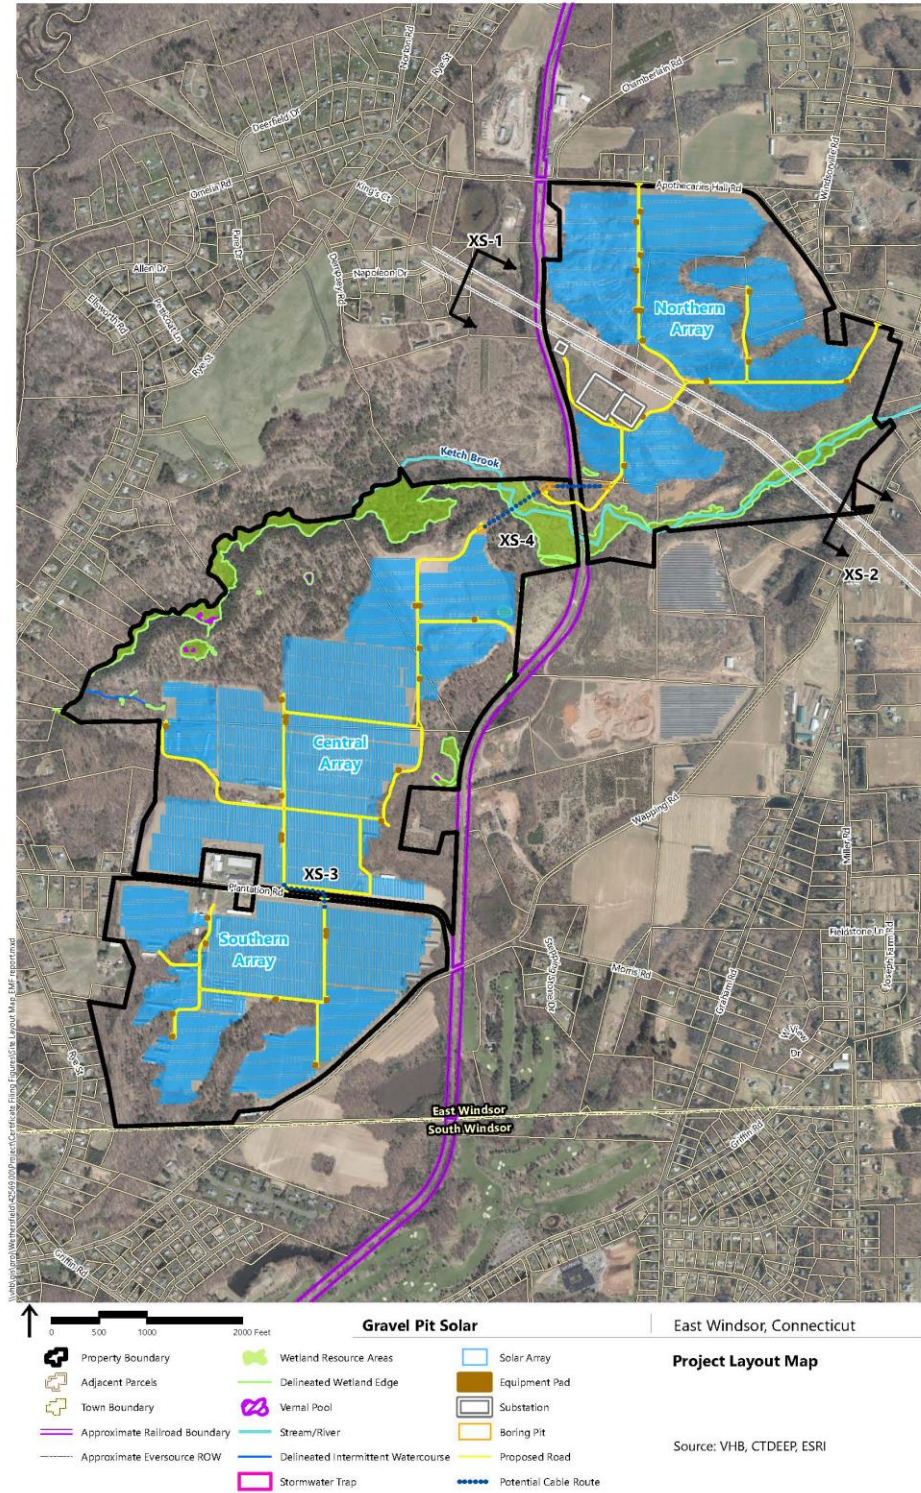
Proposed Site Plan for the Gravel Pit Solar Project annotated with locations of four representative modeling cross-sections.
